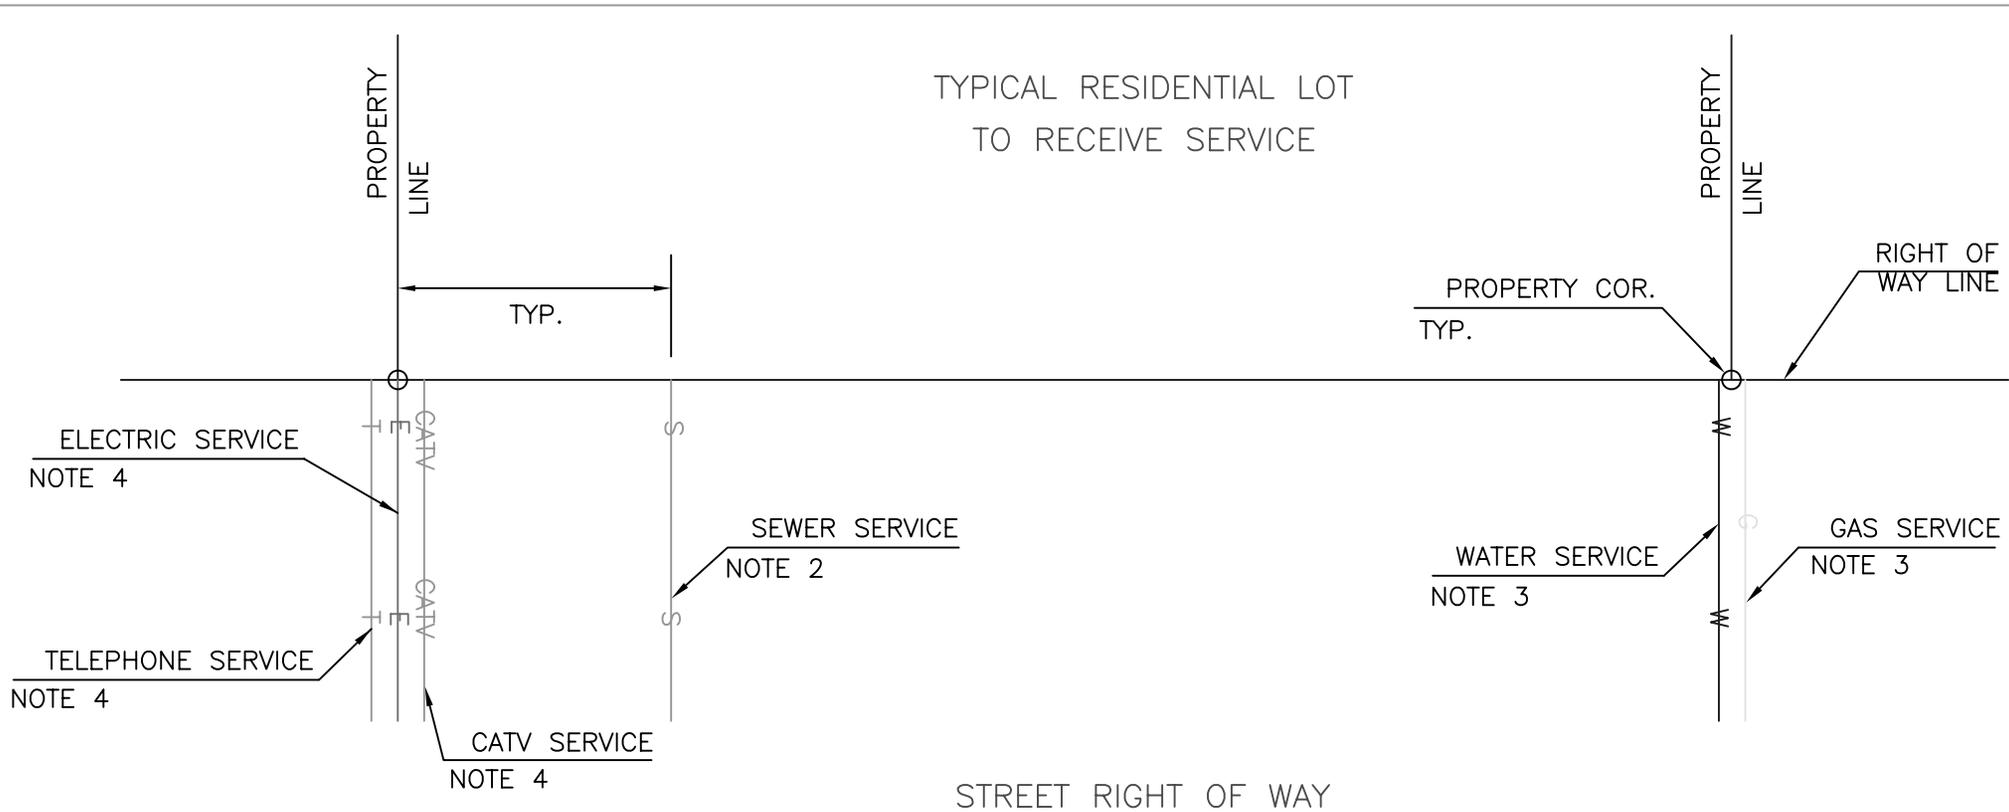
STANDARD DETAIL	STANDARD UTILITY LOCATIONS COLLECTOR STREET	CITY OF KINGMAN	N.T.S. DETAIL NO. 121
